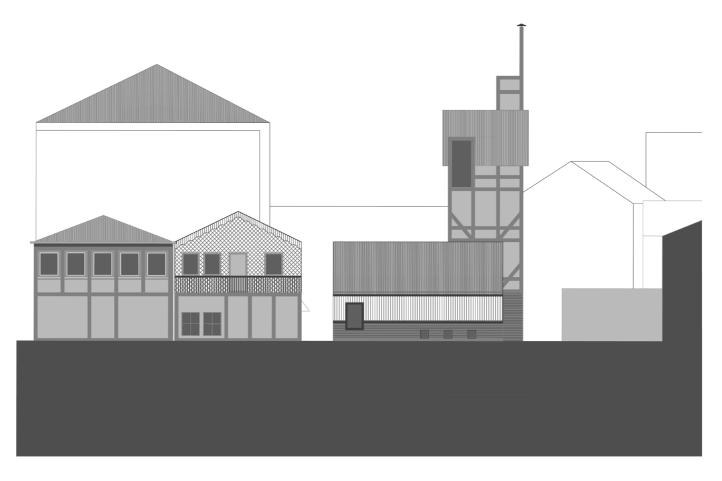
scale 1:200 ensemble of the building façades from outside of the block
